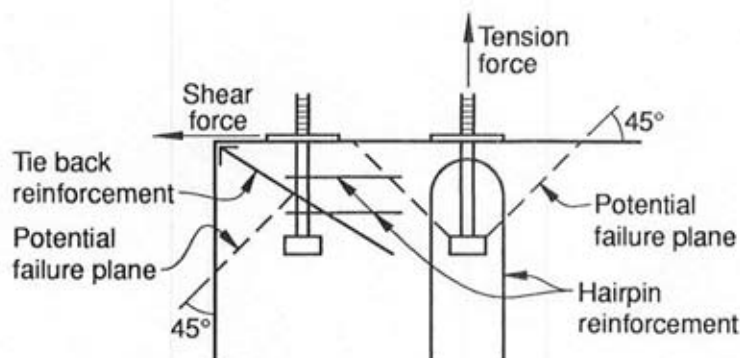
Typical Partial Embedment Failure Planes and Reinforcement
